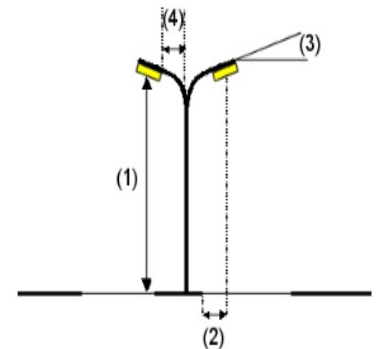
Street & Luminaire Planning details of Plan-III (Continued)
